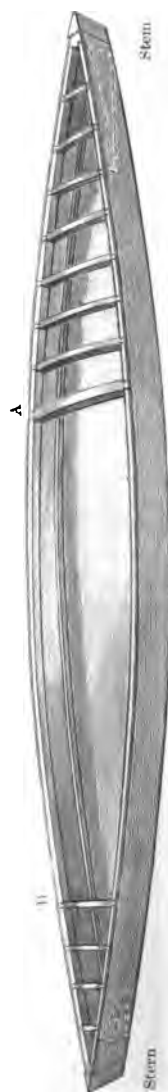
PUNT WITH GUN-BEAM (A), AFTER-DECK BEAM (B), AND DECK-RAFTERS FINED
